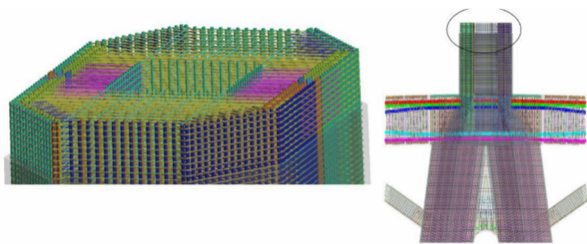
Reinforcement detail at top of tower BC (left) and overall elevation (right).
